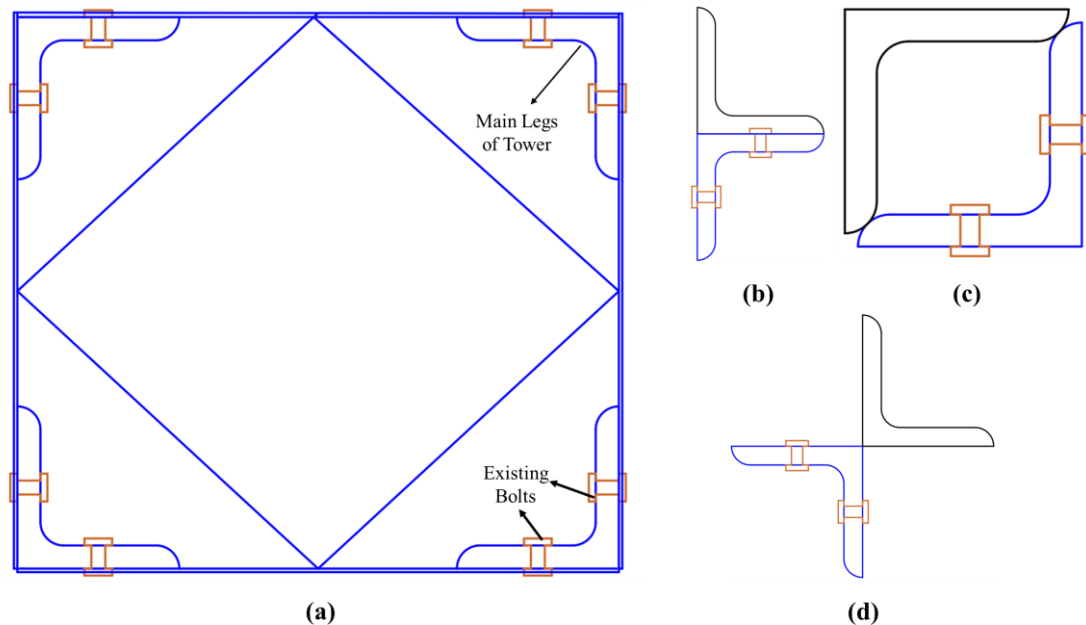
Different Built-up options with angle sections for a tower; (a) Existence tower plan; (b) bi-angled T section; (c) bi-angled box section; (d) bi-angled cruciform section
